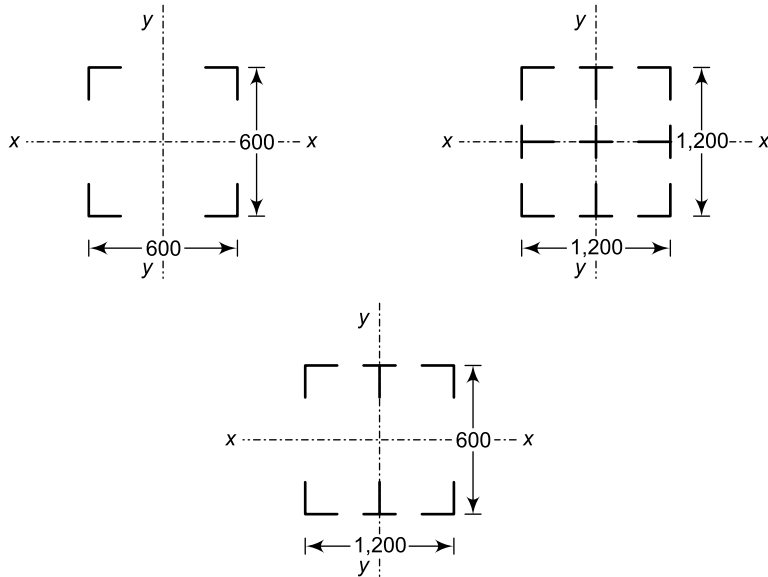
Different Arrangements of Angle Sections to Form Cribs.
